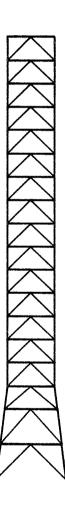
Undeformed View of Launcher Umbilical Tower (Direction-1)
